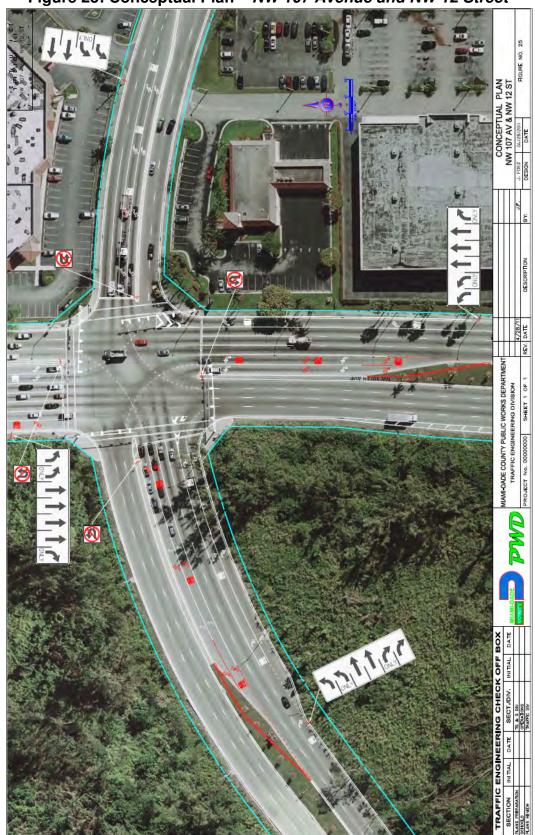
Conceptual Plan – NW 107 Avenue and NW 12 Street
